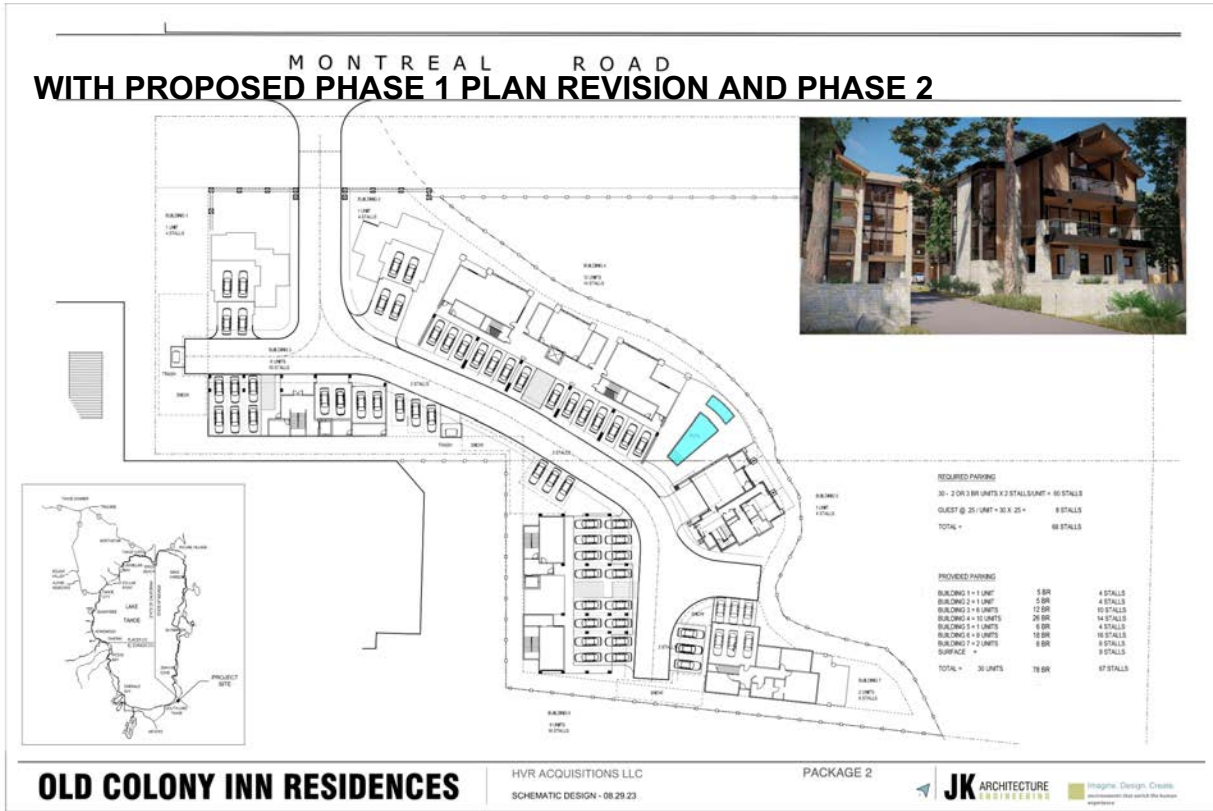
Site Development Plans - Multi-Family Residential Project
